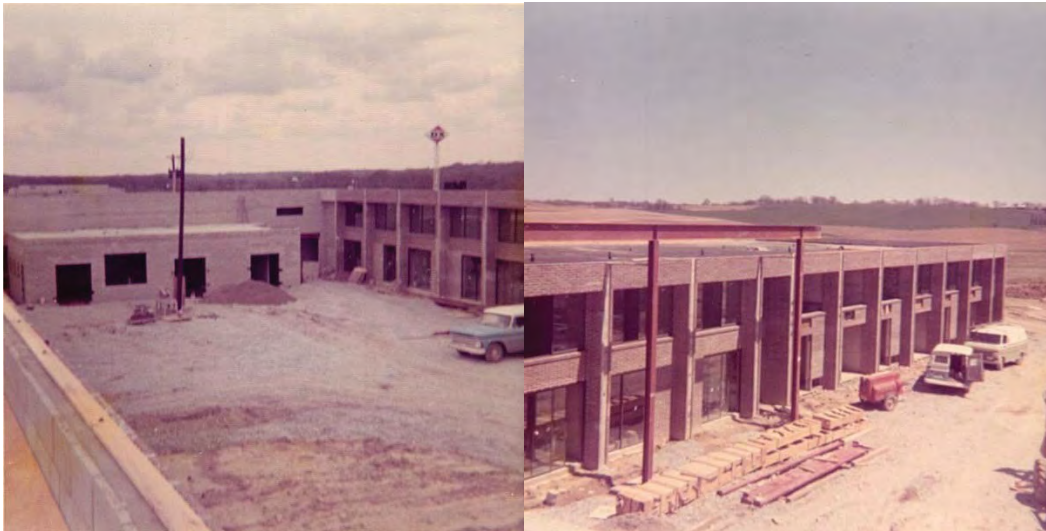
, 8-48: Construction photos, left, roof framing and wall details, looking west, and right, veneer work on south motel wing, south facade, looking east, both May 1973 (Courtesy of Sheila Boyd)
